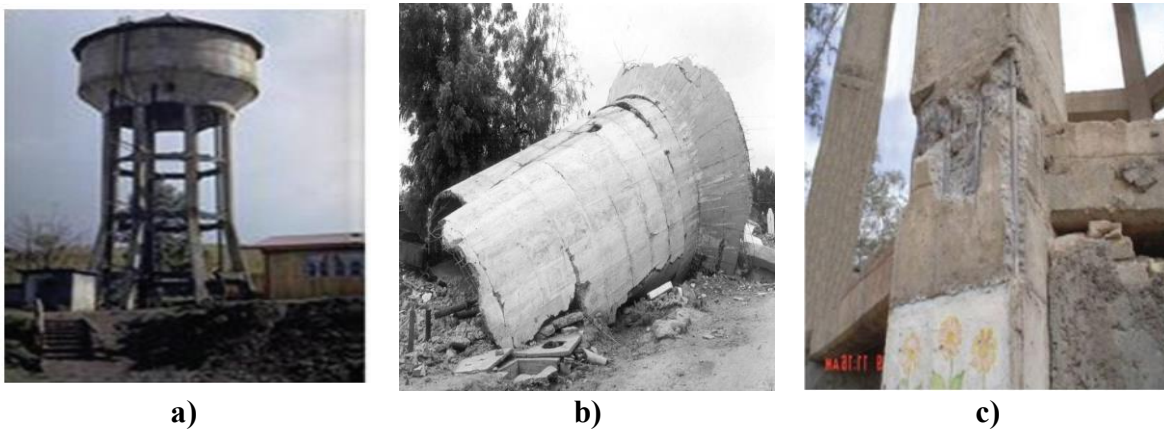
a-c) Examples of RC elevated water tanks damaged and collapsed in the earthquake [14, 15].
